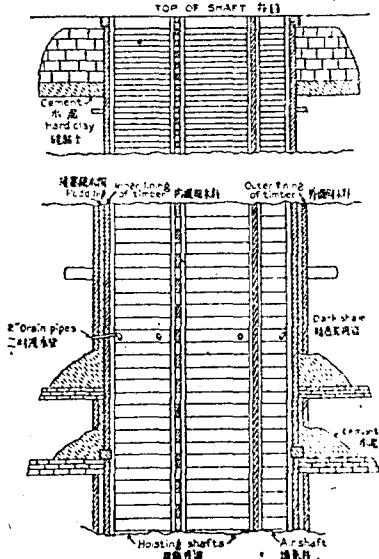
Section showing method of sinking shaft through water-bearing stratum at Bevis salt plant, Lyons, Kans.
